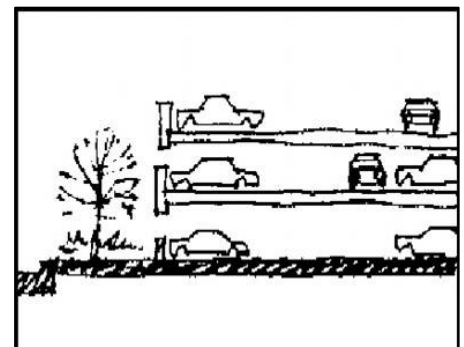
Parking structures reduce the paved area needed for parking, but are expensive and highly visible.
